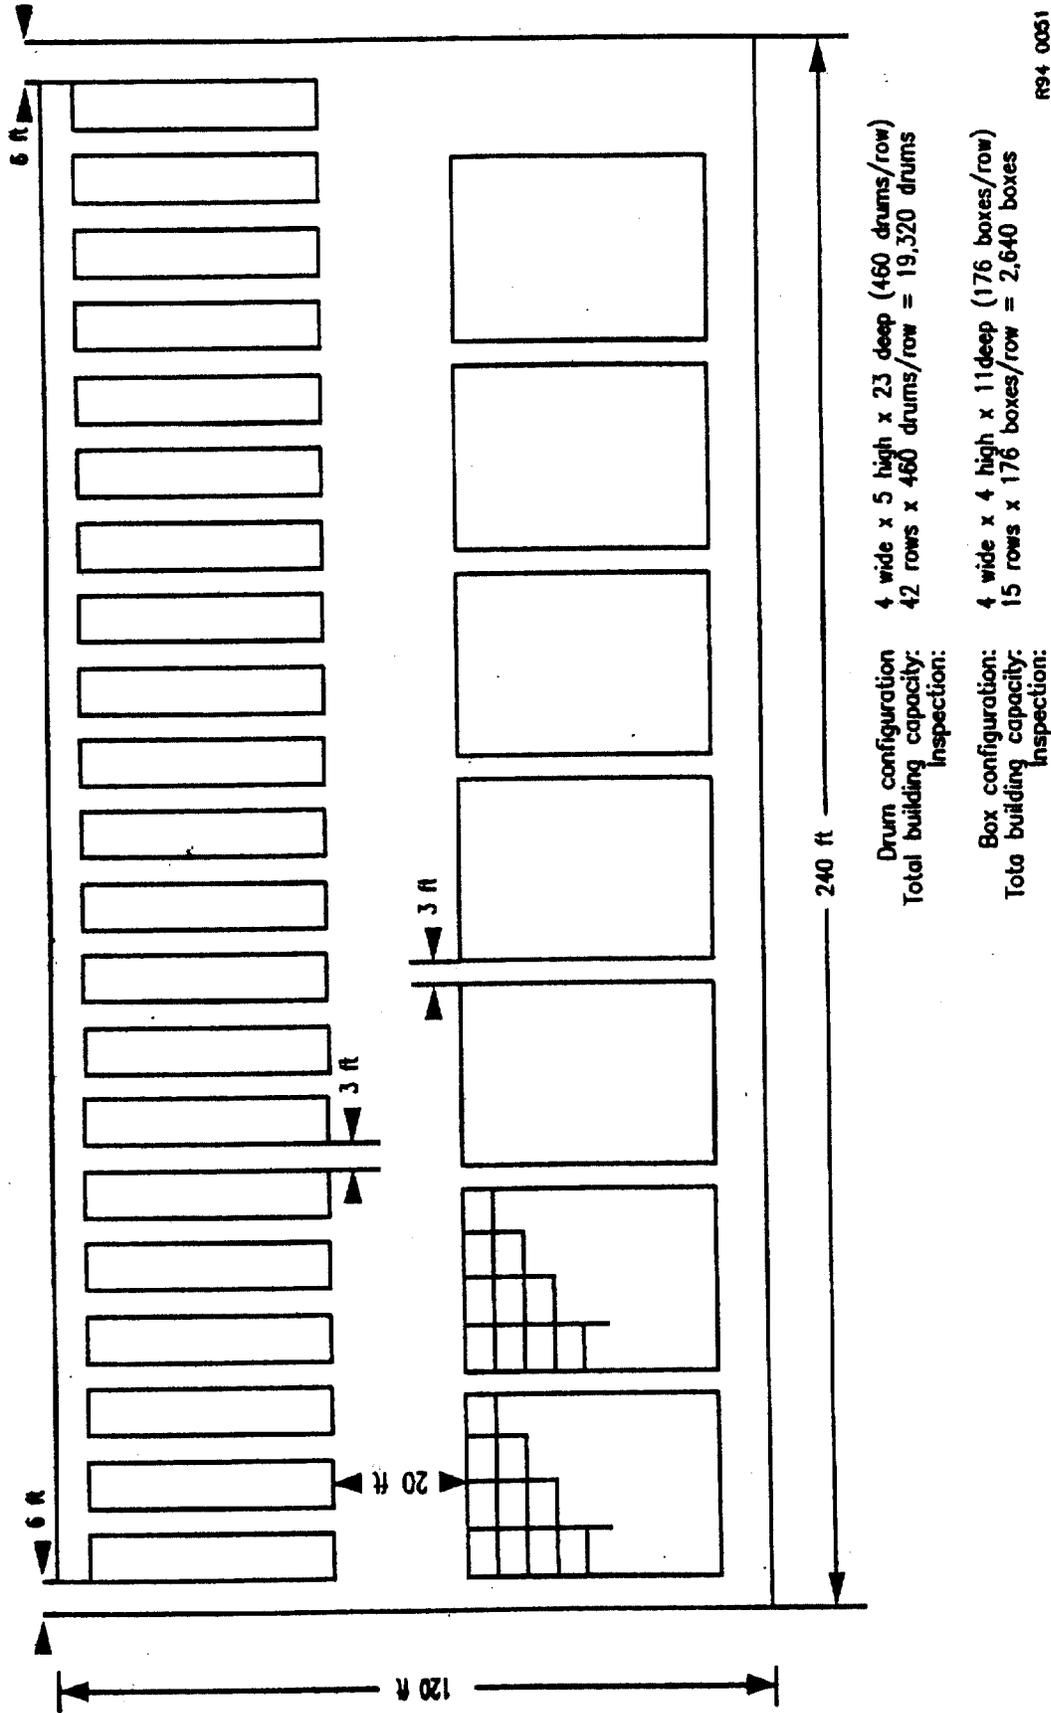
Typical floor plan of Type II storage modules (WMF-628 through -633).
